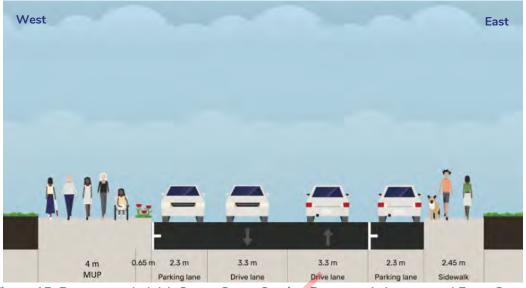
Recommended 4th Street Cross-Section Between A Avenue and Front Street
